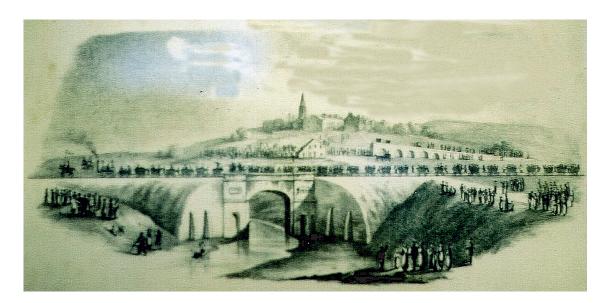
Engraving showing the opening of the Stockton & Darlington Railway (DL L297) Skerne Bridge is in the centre; the assessment site shown as an open area
